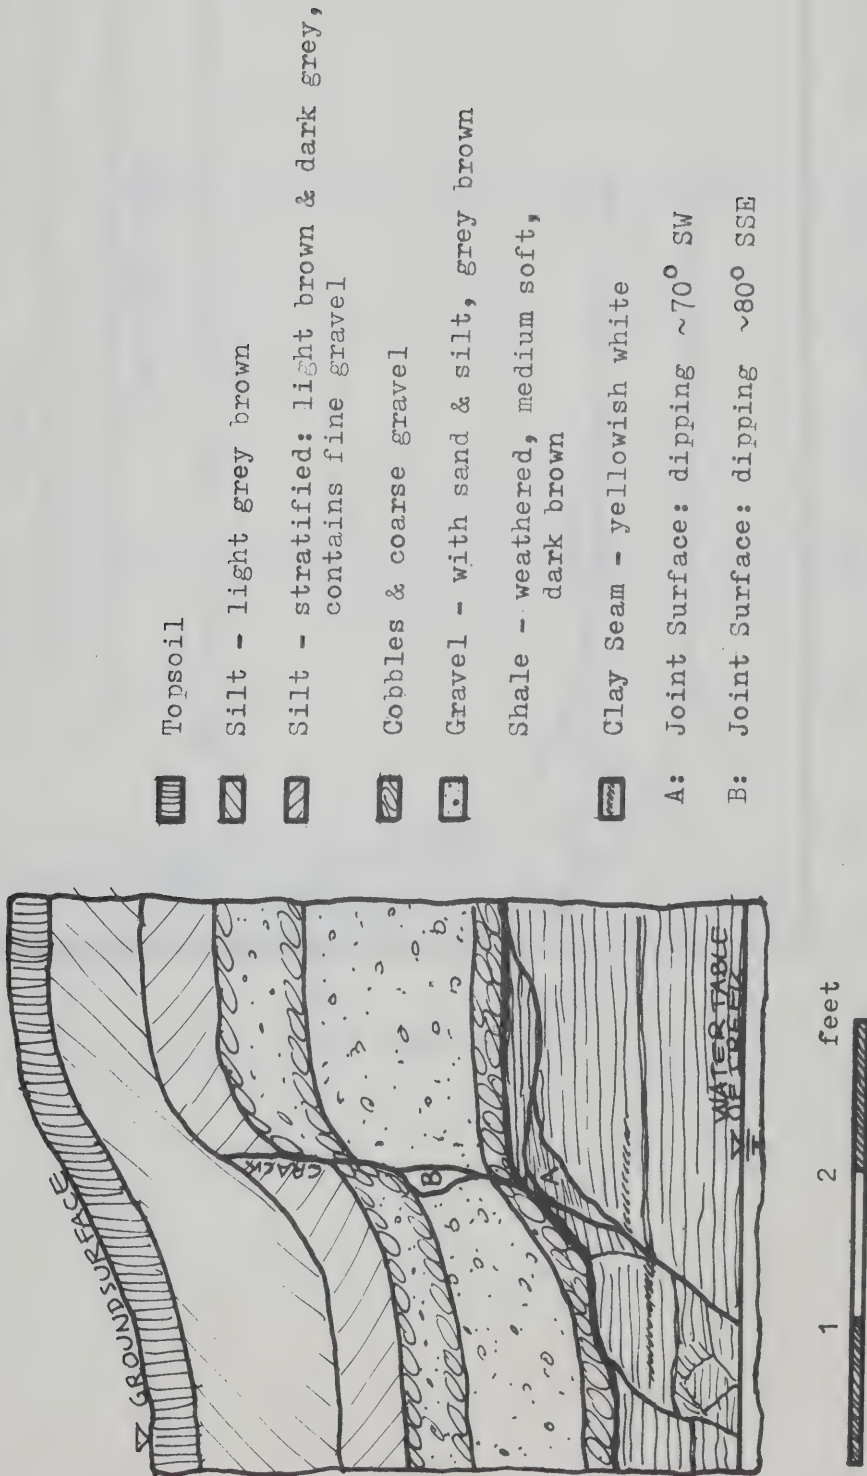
FAILURE OF PEACE RIVER BRIDGE AT TAYLOR, B.C.:
